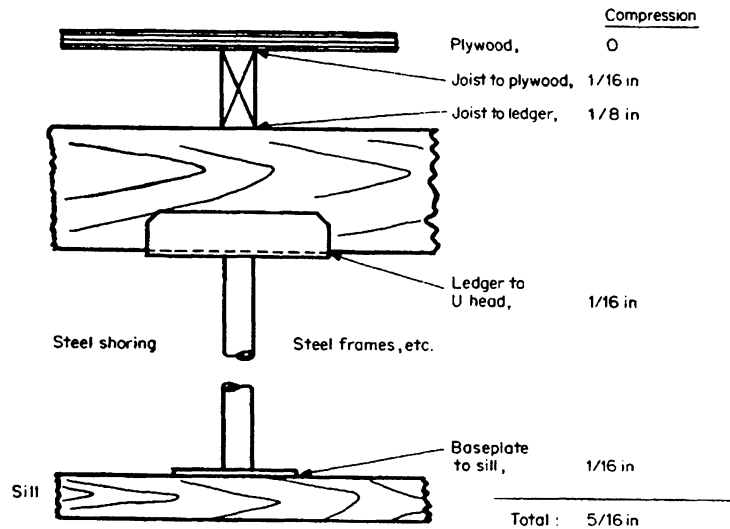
Compression of lumbar surfaces in a shoring tower stackup.
